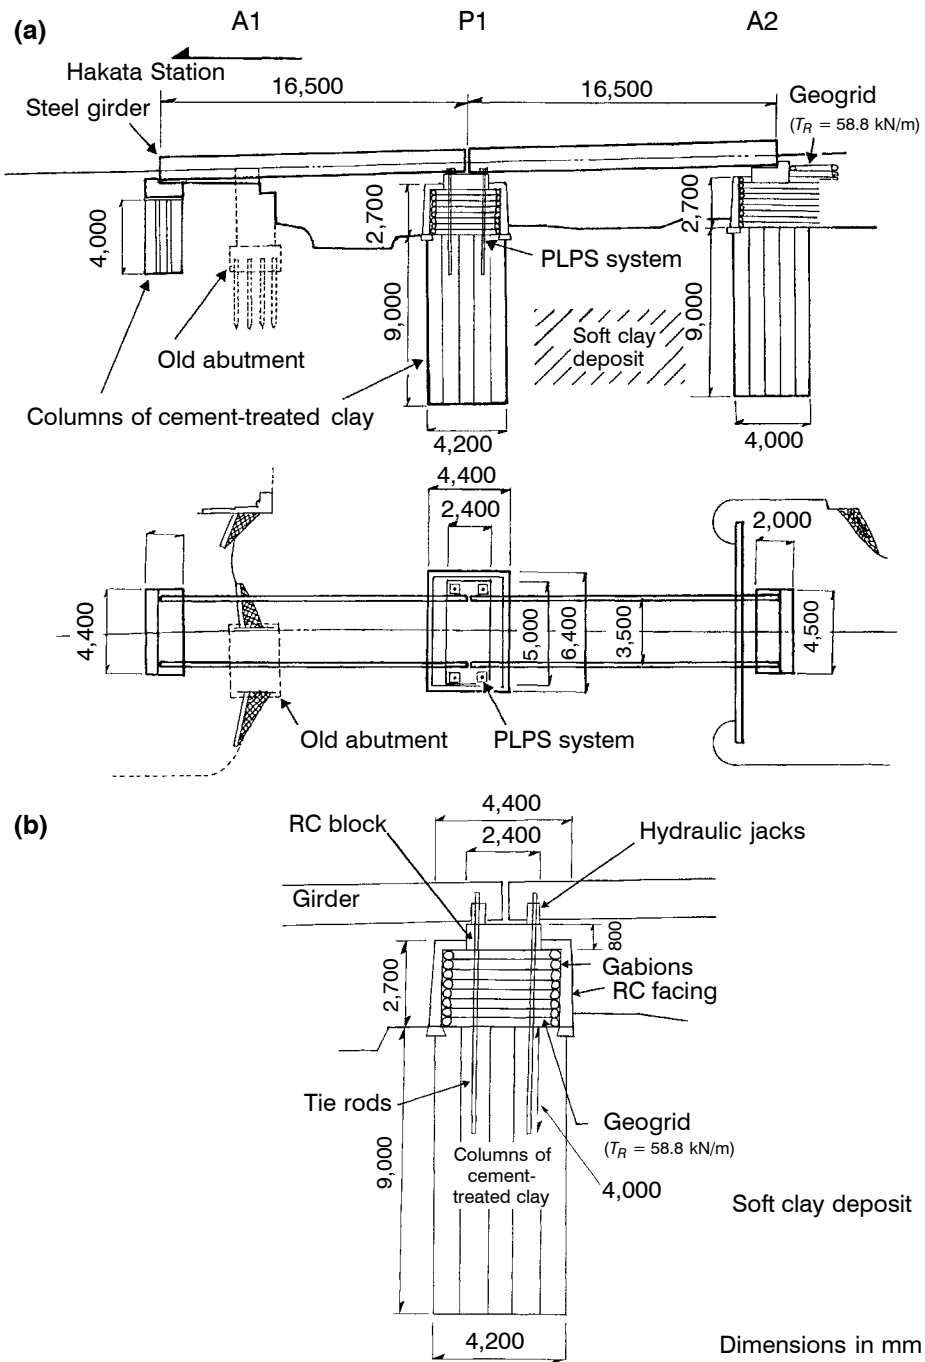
The first PLPS GRS bridge pier located on the Sasa-guri Line (Location 57, Figure 3) (temporary structure): (a) cross section and plan view; (b) detailed schematic of the pier.
